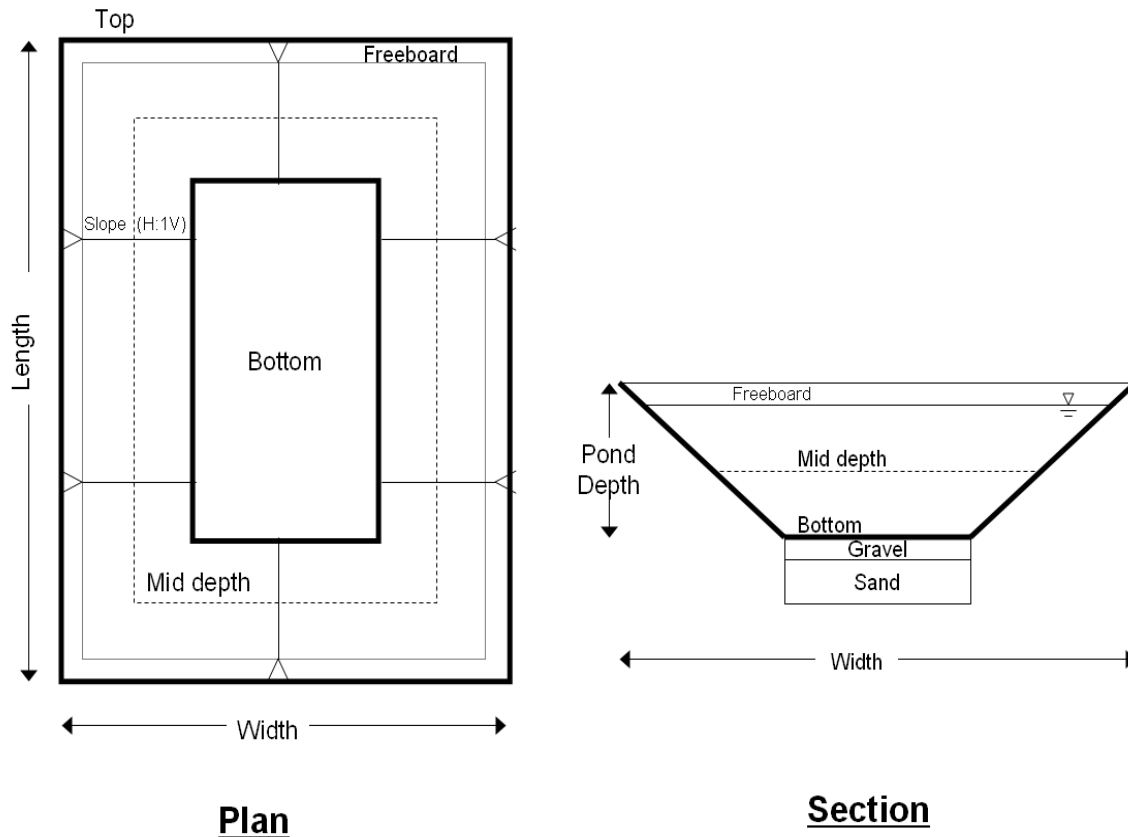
Rectangular layout of sand filter with trapezoidal cross section
